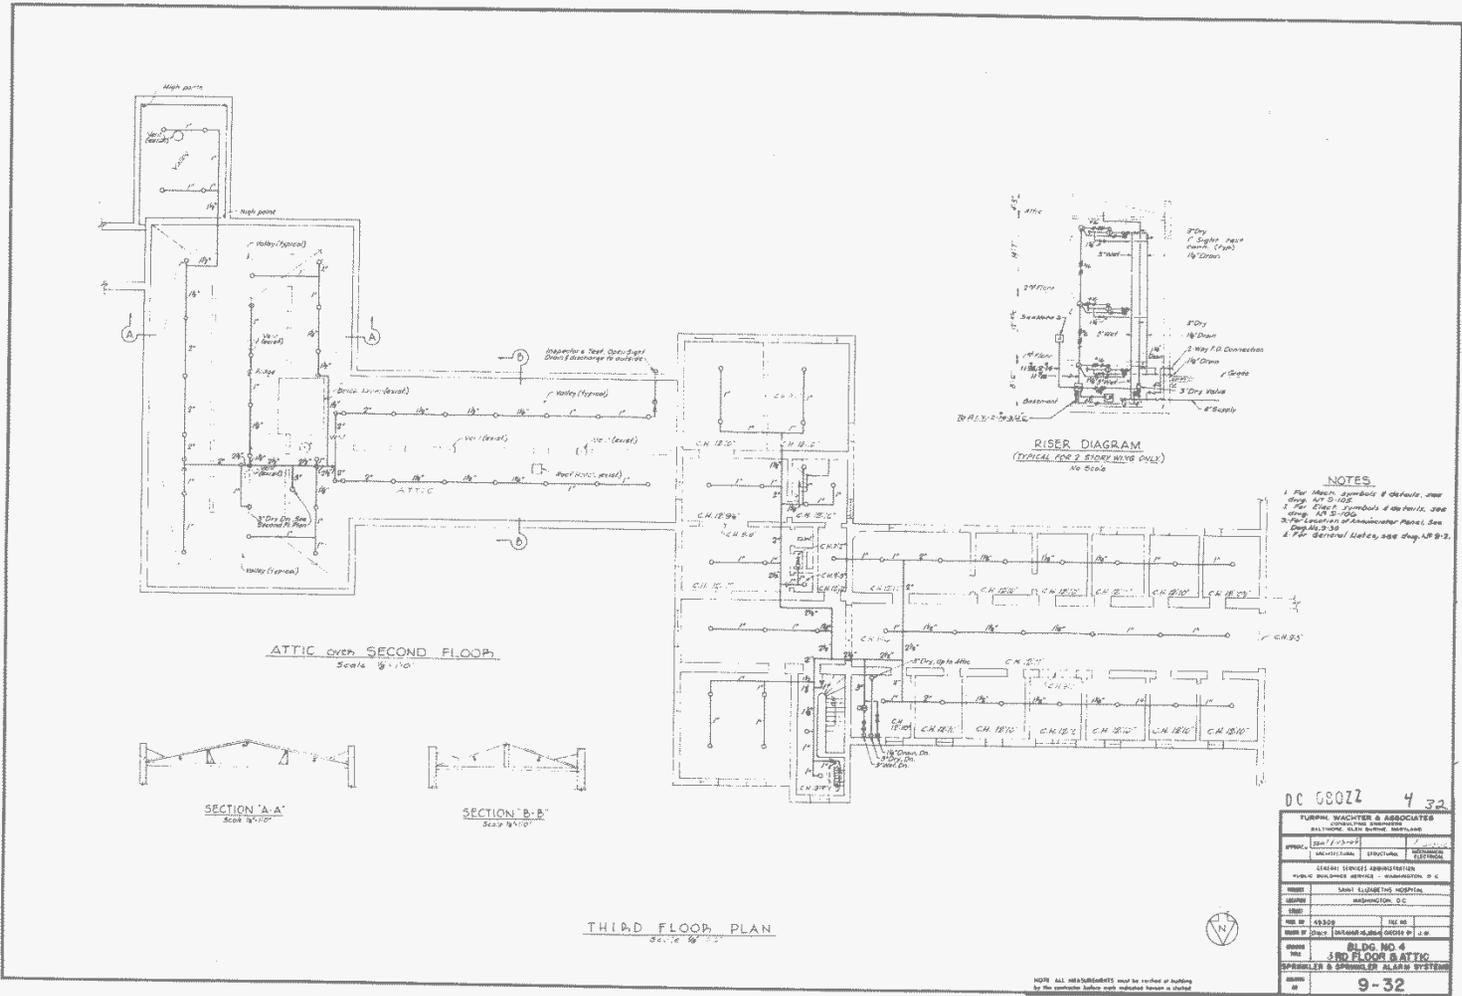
Third floor plan of the East Wing outlining fire suppression system improvements, 1964. Source: GSA archives, image DC0080SE0004.
